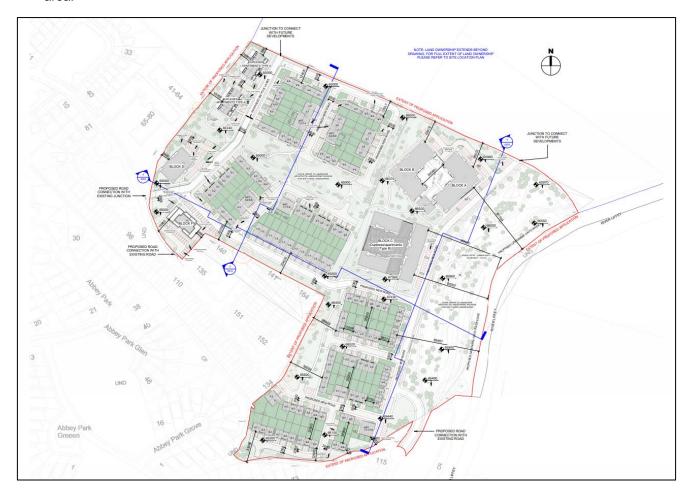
Site layout plan of proposed development of 333 no. residential dwellings
